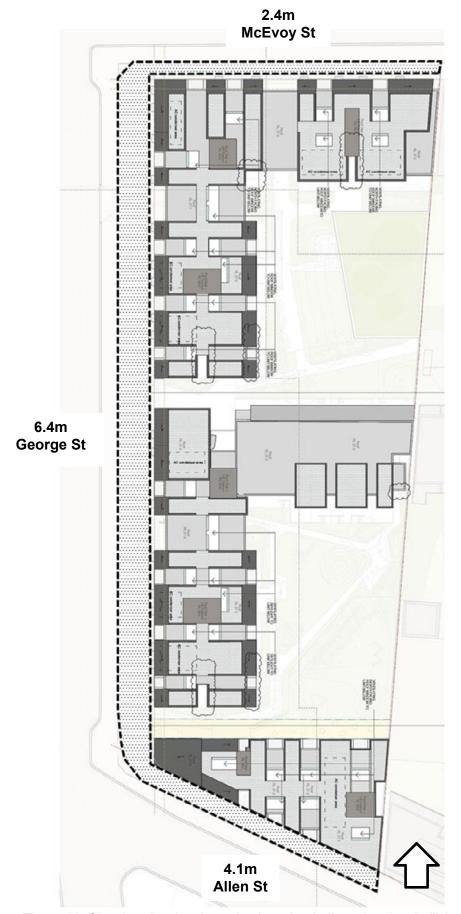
Site plan showing the setbacks to be dedicated and embellished.
